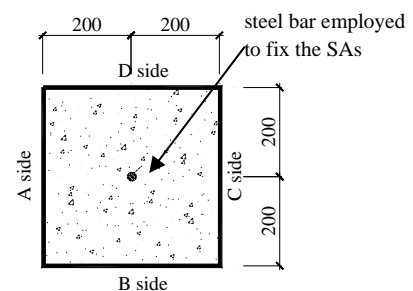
SA with embedded PZT patch and wire Figure 2.2. Cross section of the CFST specimen
